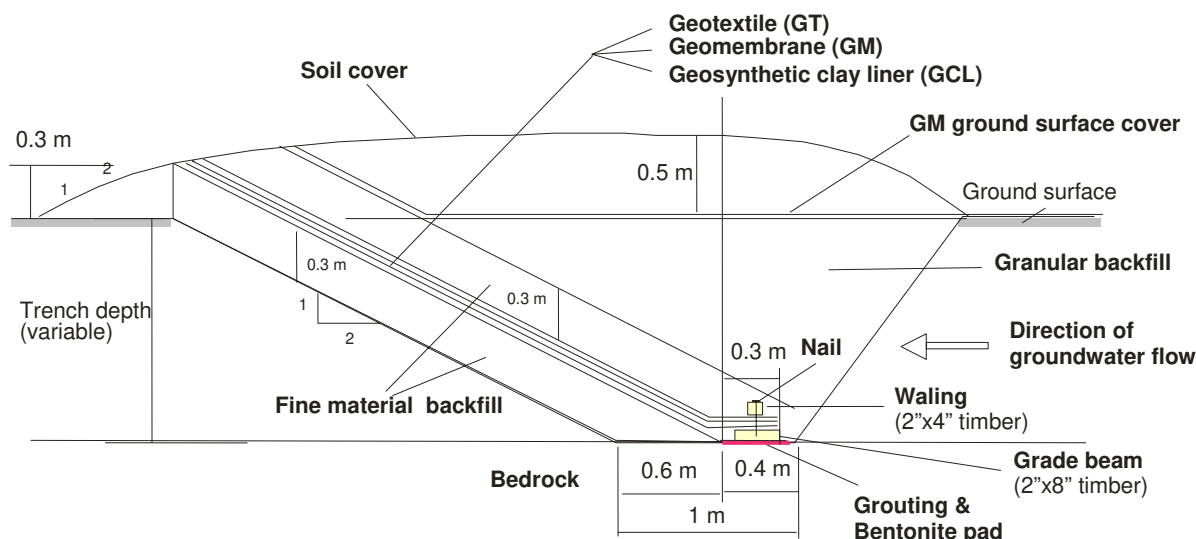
Installation of geosynthetic barrier system anchored to bedrock (Case 2).
